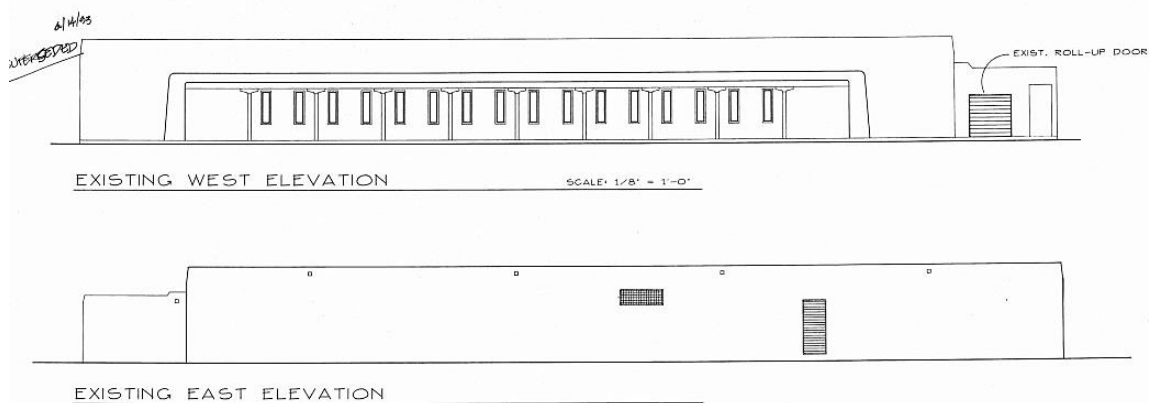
Existing elevation drawings of west and east elevations, c.1993. Case H-93-111. Creator: Terraplen Architects, Planners, Landscape Architects. Courtesy Terraplen and City of Santa Fe Historic Preservation Division
